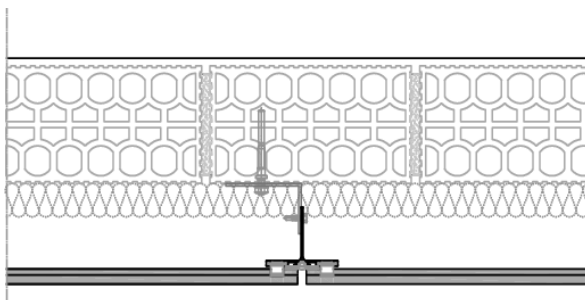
Vertical section. Faveton® SAH Ceram 28.
